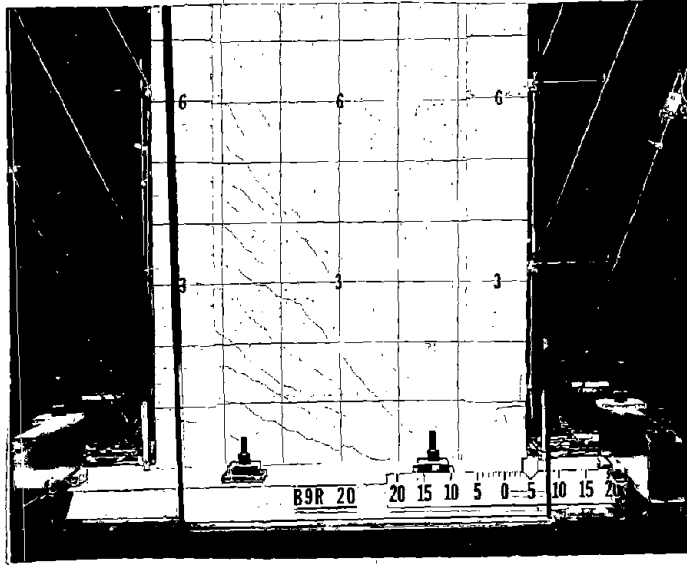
Cracking Pattern at Maximum Positive Load in Cycle 2 for Specimen B9R
